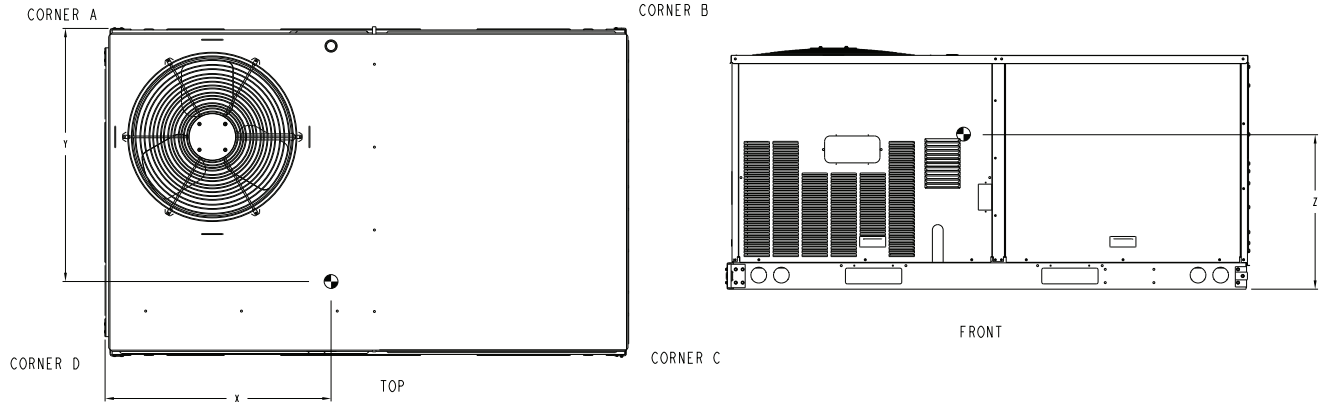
Dimensions RAS 036-072 (Sheet 2 of 2)
